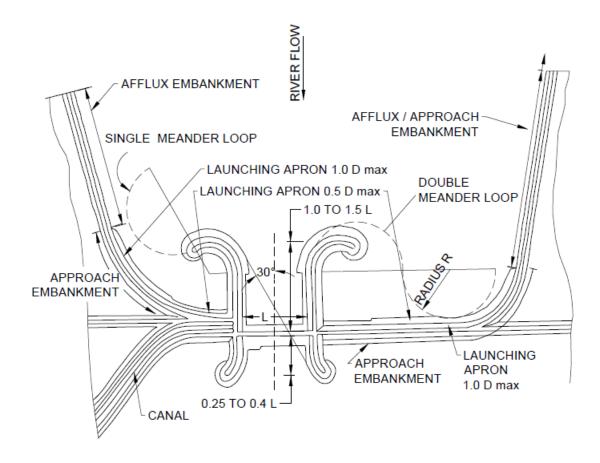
Typical Layout Plan of Guide Bank for Barrage
